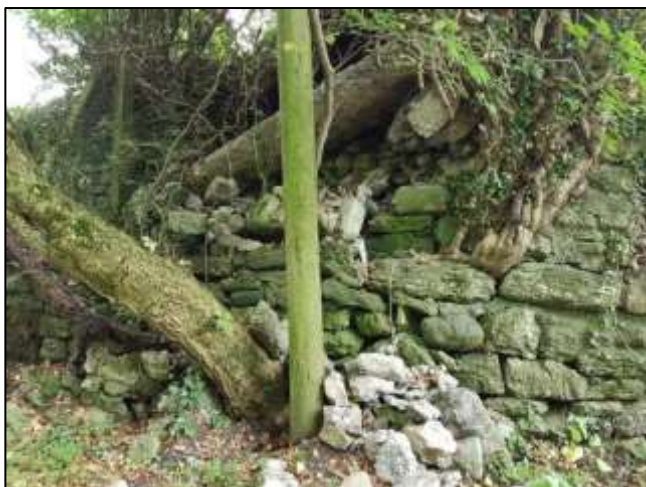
Structural damage on the walls downstream of Beetham Bridge
